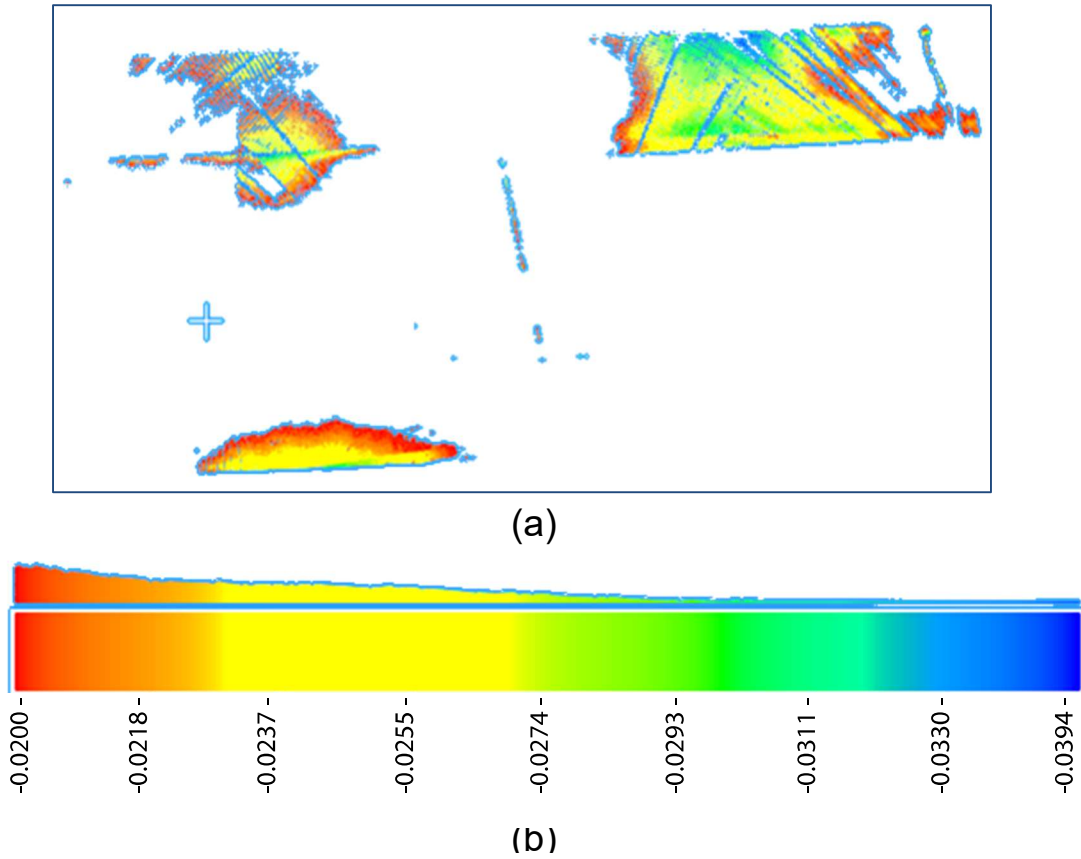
(a) Plane Fitted Bridge Deck of Structure 1816154, (b) Elevation scale after choosing the representative Elevation ranging from 0.005 to -0.035
